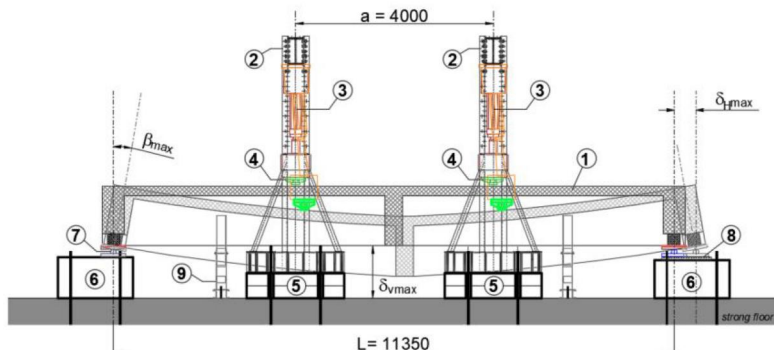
Global view of the designed experimental setup. In the lateral view of the setup, deformed configuration of the girder is superimposed to the undeformed one.
